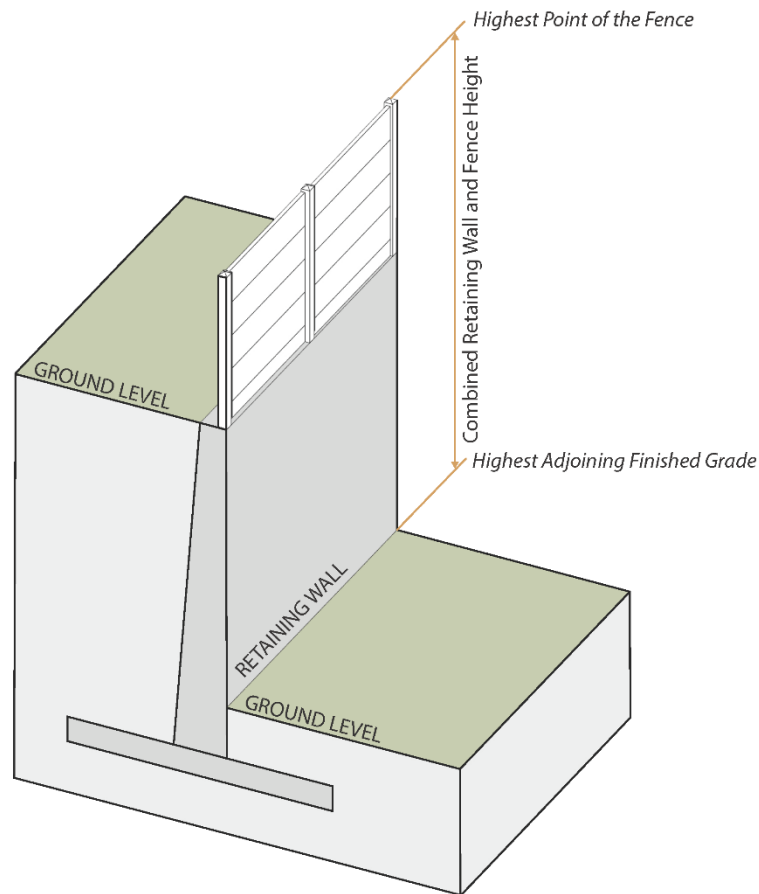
Measuring Height of Fences on Retaining Walls.
